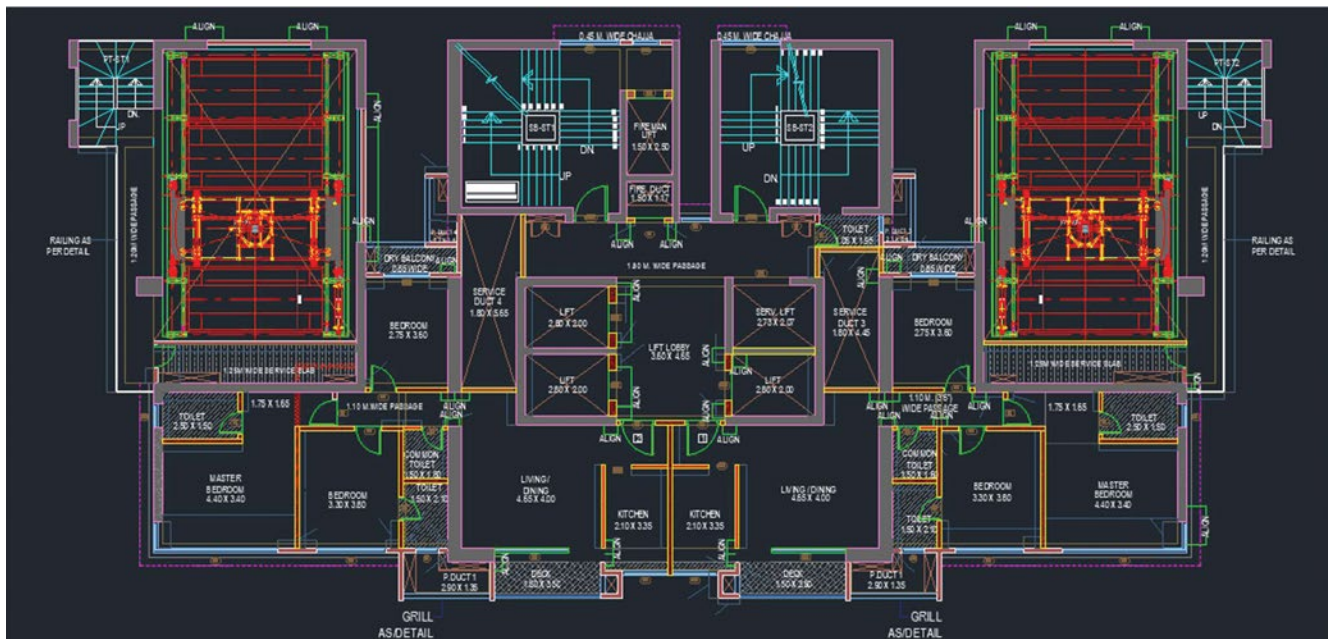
Typical architectural plan of G+34 building to obtain The north direction arrow from the architect
